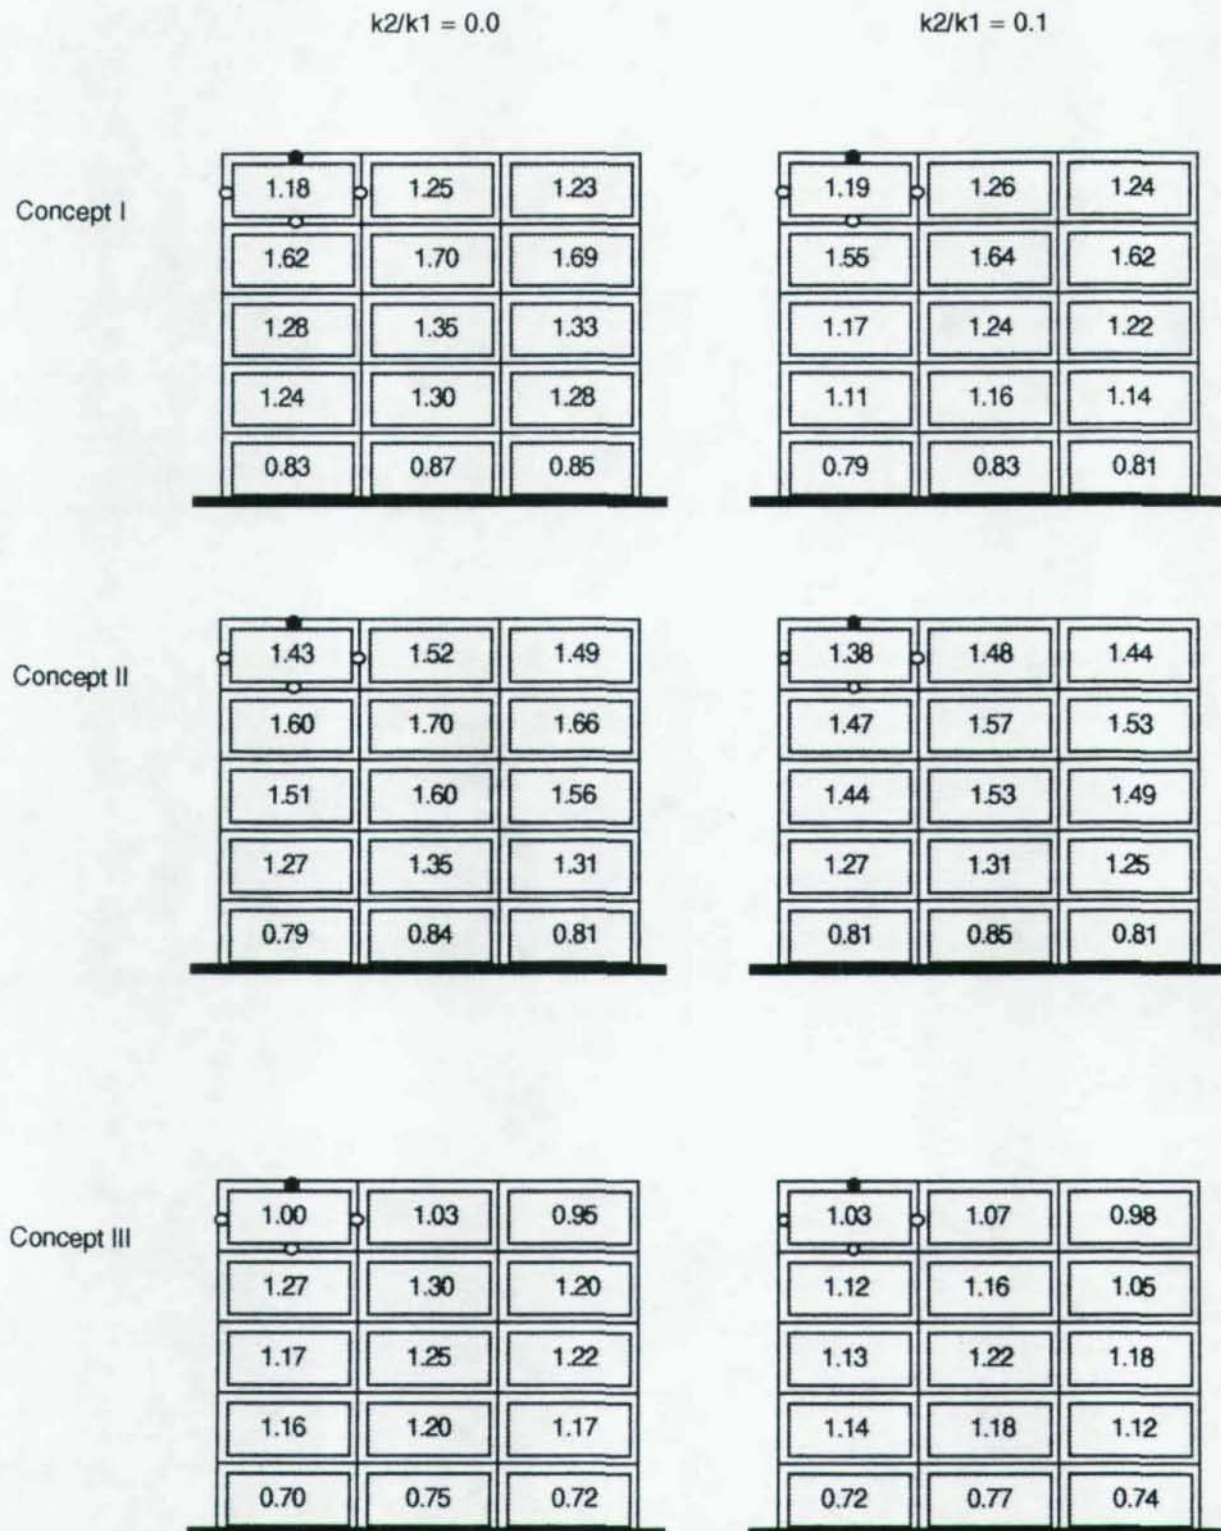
Clad Frame B: Envelopes of Deformations (in.) of Top Panel Connections
